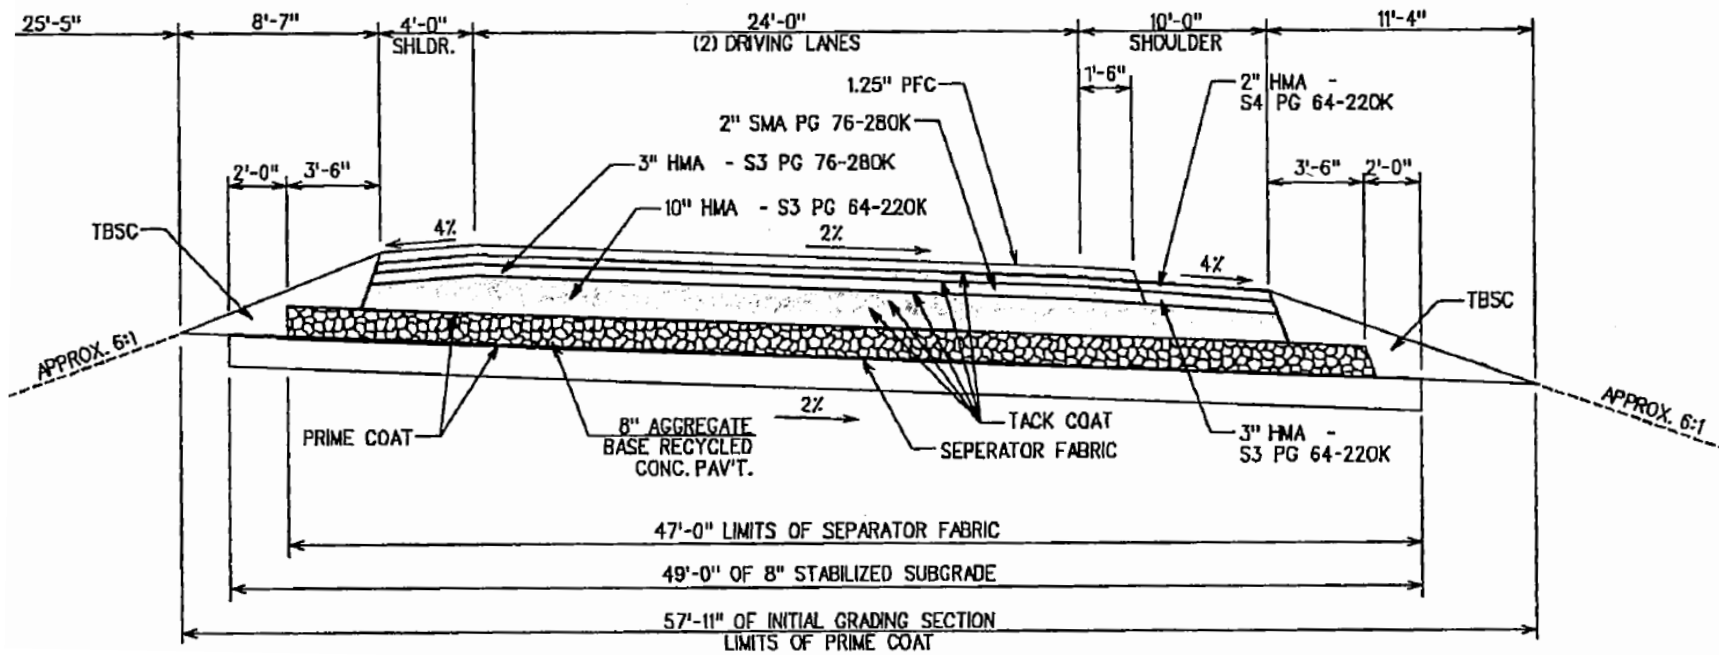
Flexible Section of I-40 Pavement Rehabilitation Project (Eastbound)
